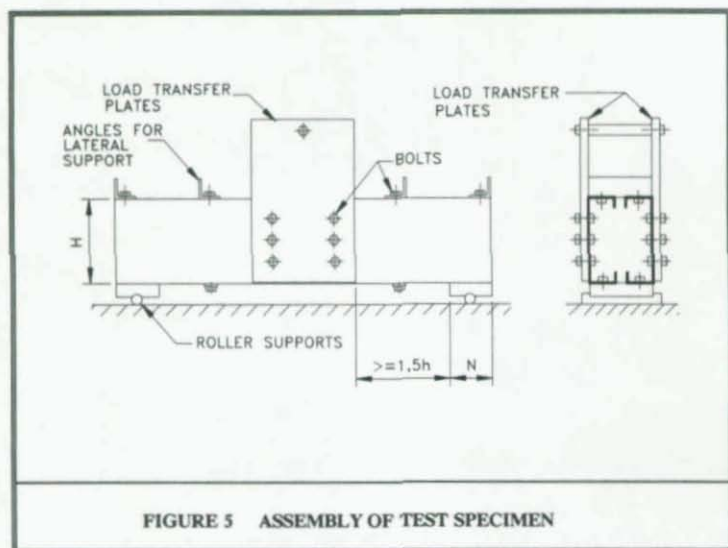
ASSEMBLY OF TEST SPECIMEN
